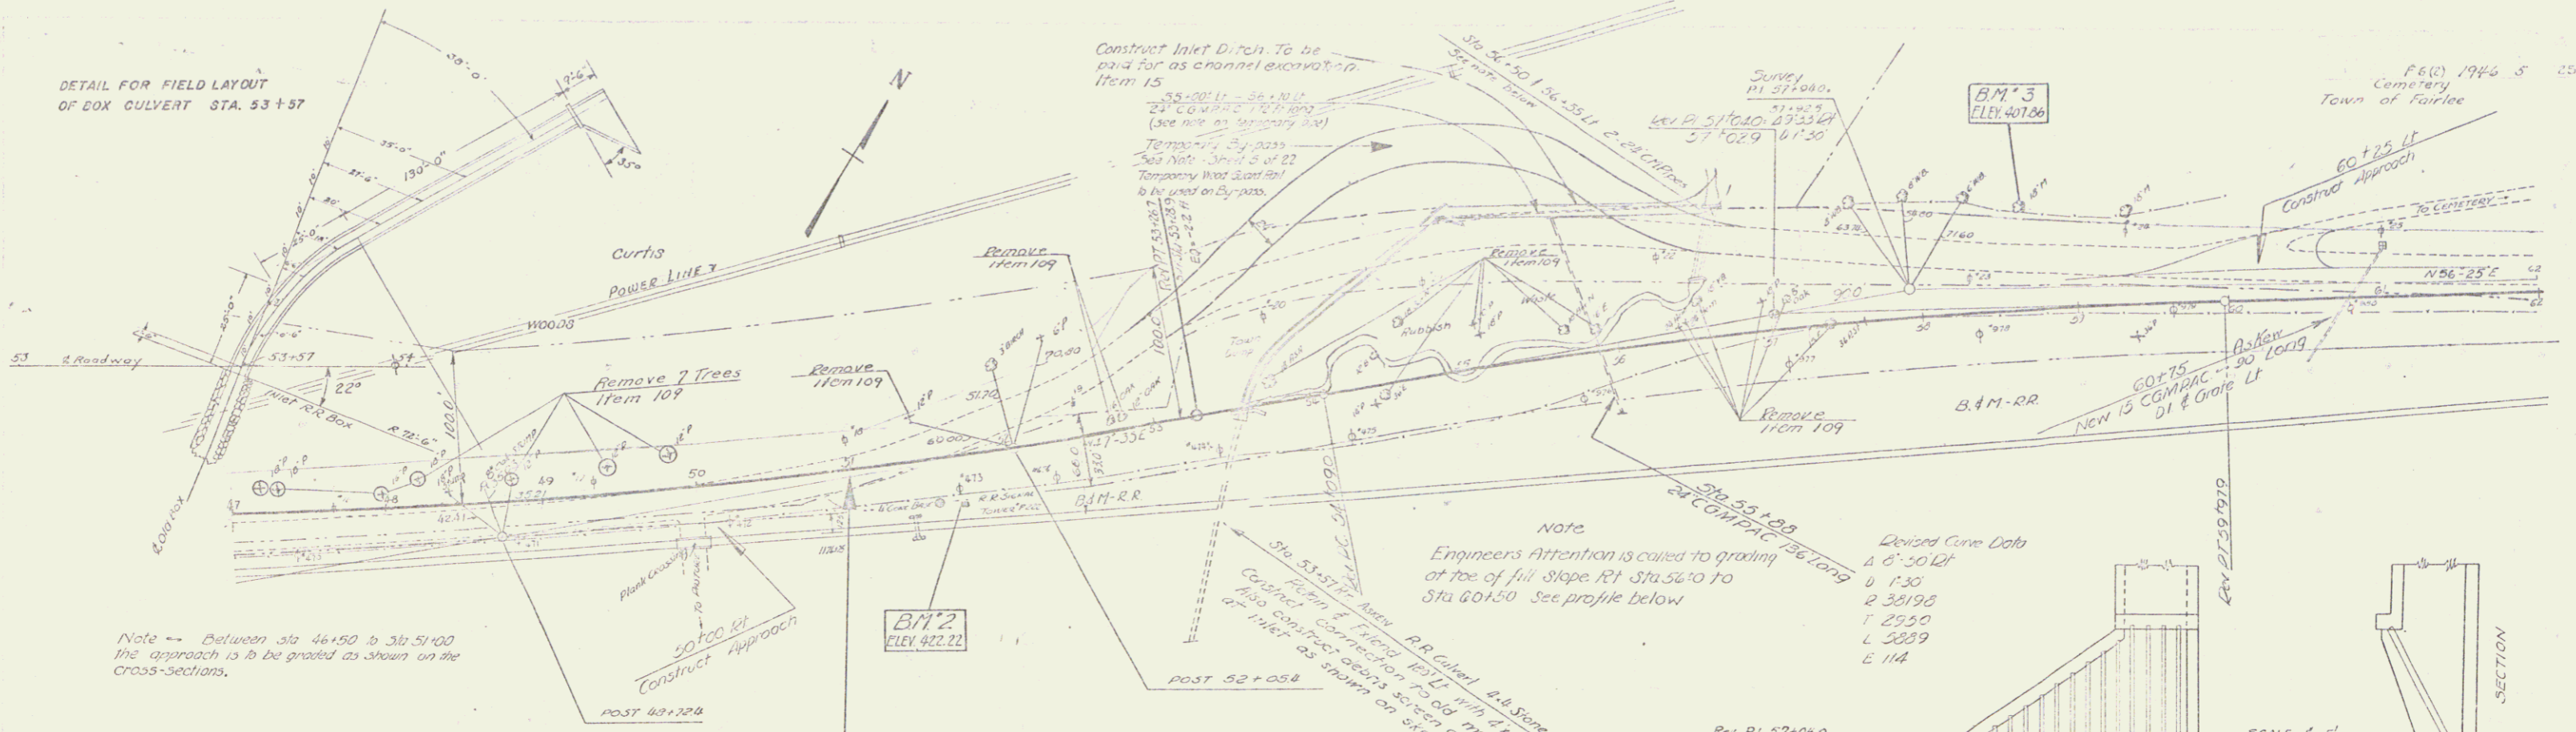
DETAIL FOR FIELD LAYOUT OF BOX CULVERT STA. 53+57
